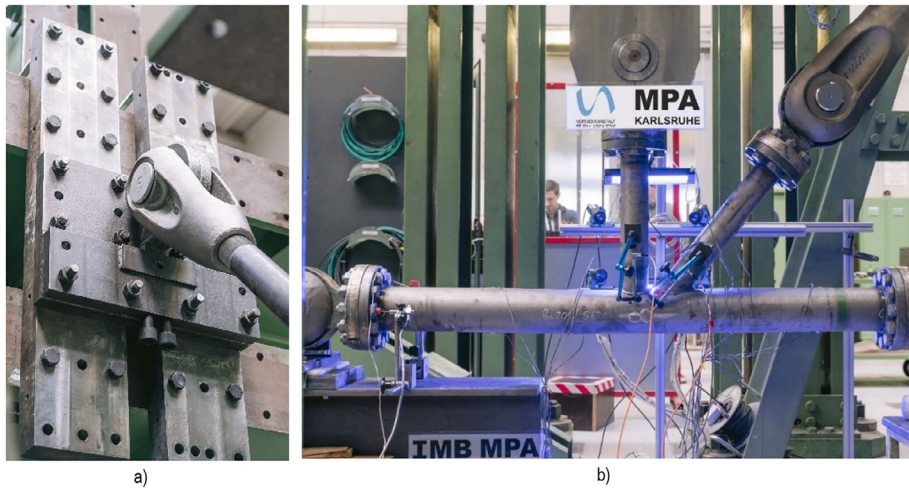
a) Height-adjustable bearing of the diagonal brace (7) and b) CHS specimen installed in the test rig [4]
